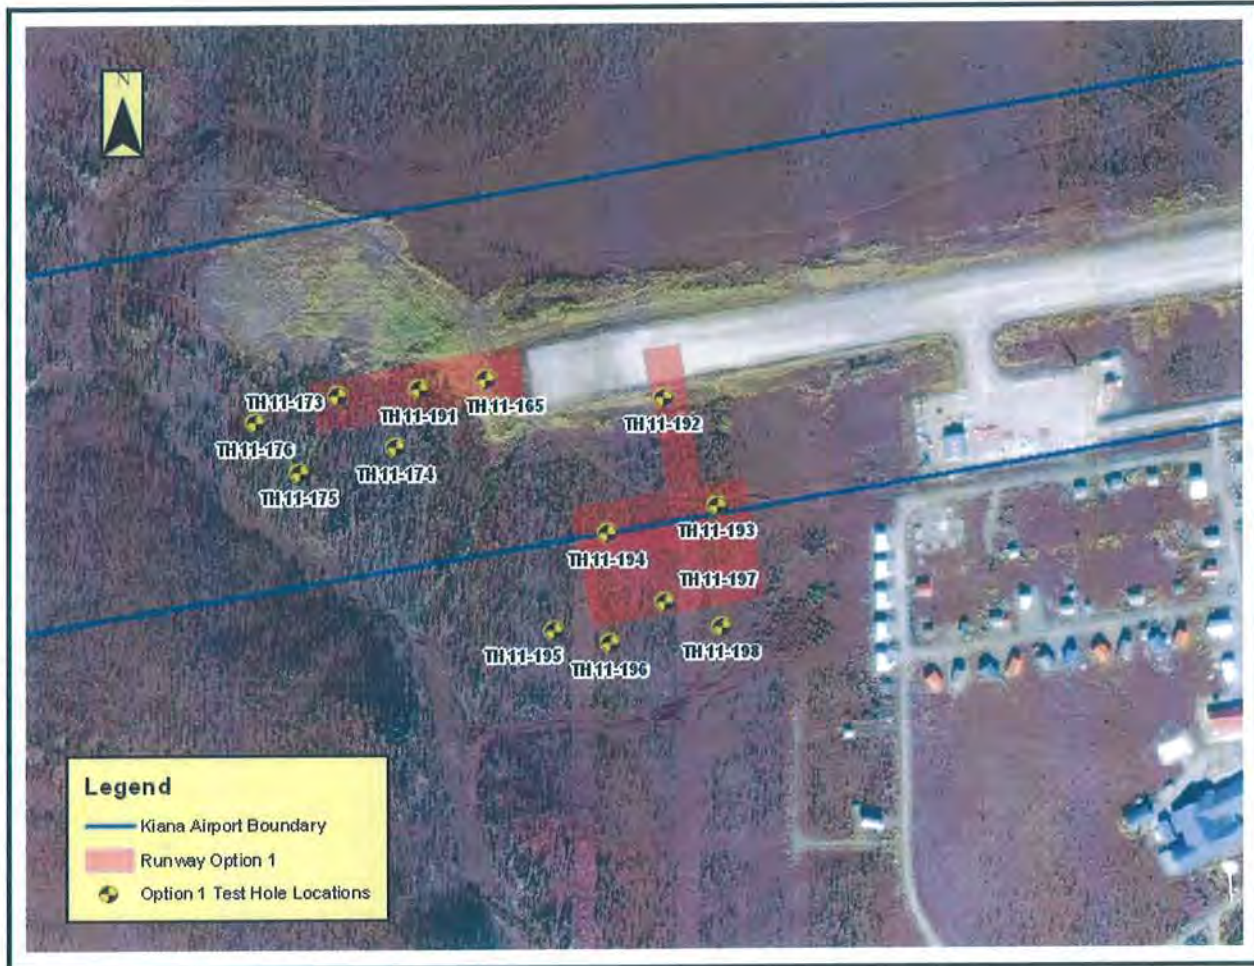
Proposed Runway Option 1, with Test Hole Locations. Some test holes drilled beyond planned extension in proposed fill slope areas.
